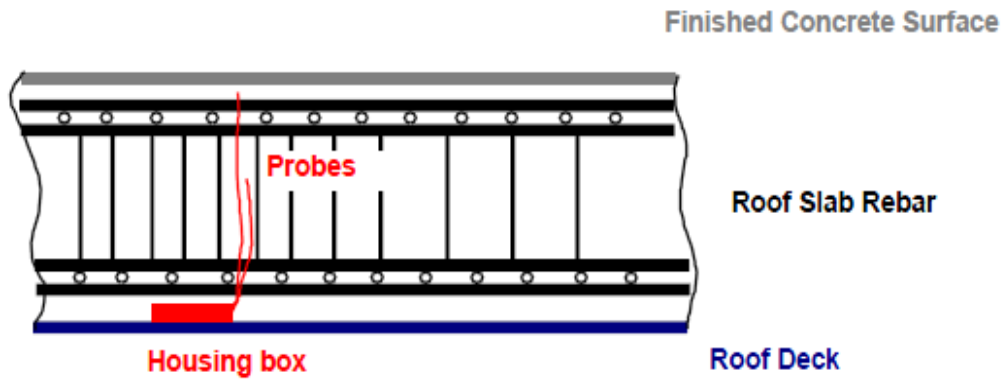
Typical temperature sensor installation for ceiling slab (adopted from CH2M)
